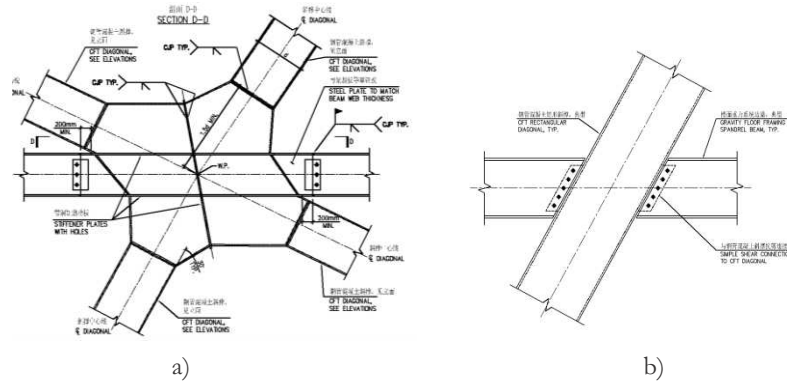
OT1 - Connection typology between the spandrel beams and the diagrid elements a) moment connection, b) simple shear
